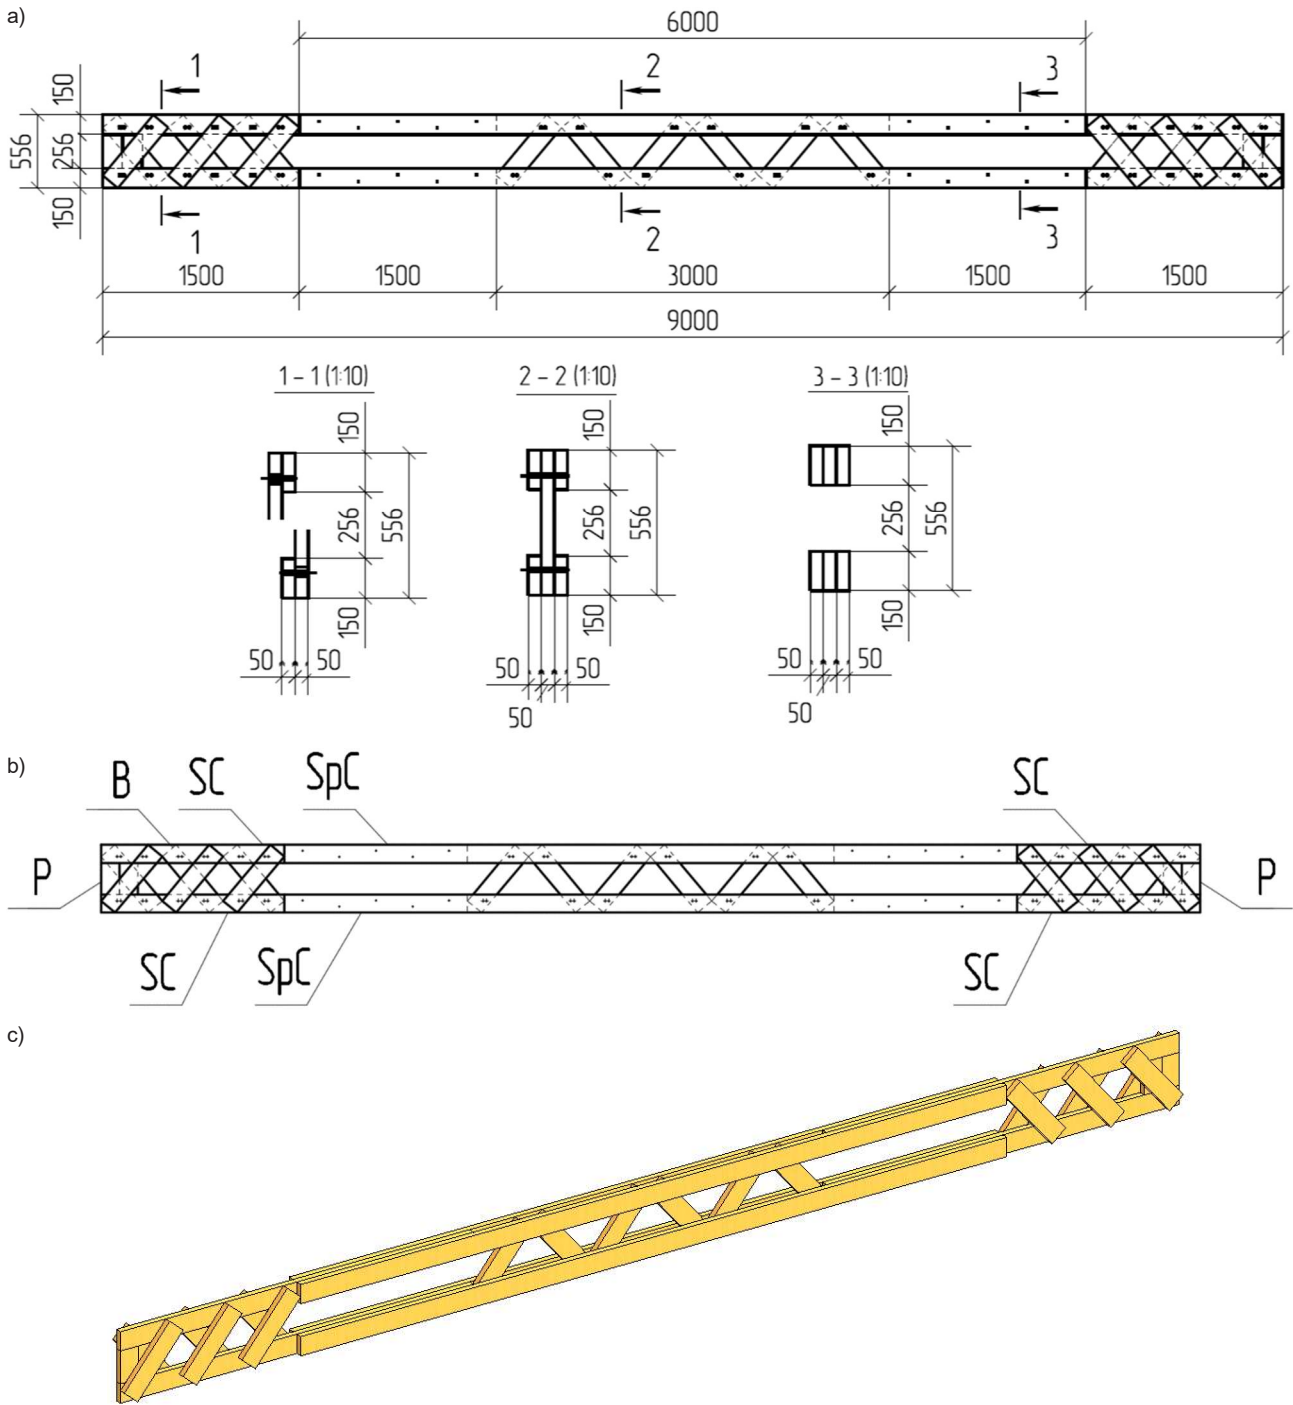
Lattice girder truss: (a) geometric dimensions; (b) description of the beam elements; (c) 3D view.
